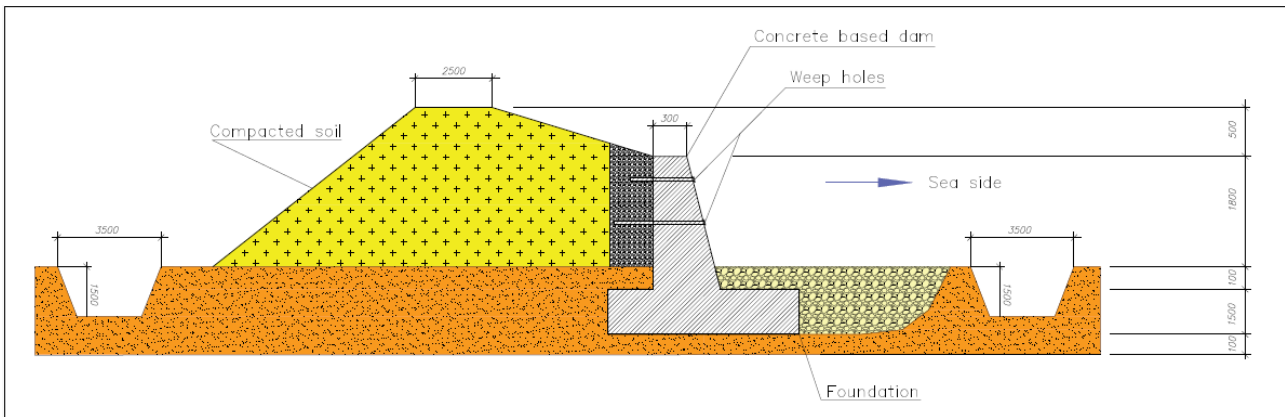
Dyke Wall-type semi-ground dam(mm)
